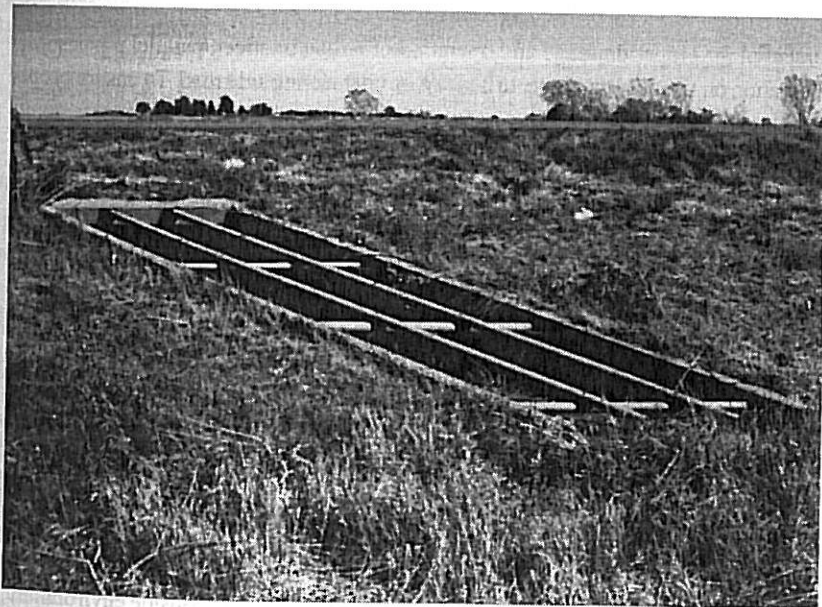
Safety Treatment for Cross-Drainage Culvert
